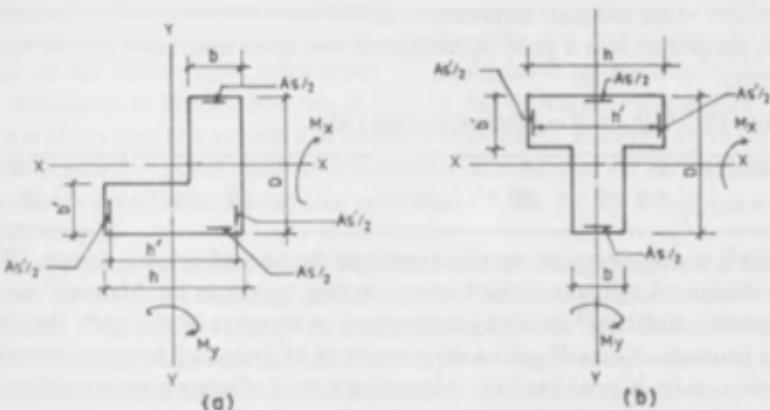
Design of flanged column. (a) L-shaped section; (b) T-shaped section.
